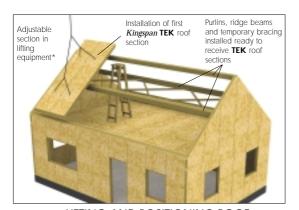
LIFTING AND POSITIONING ROOF SECTIONS ONTO THE ROOF WITH A CRANE
